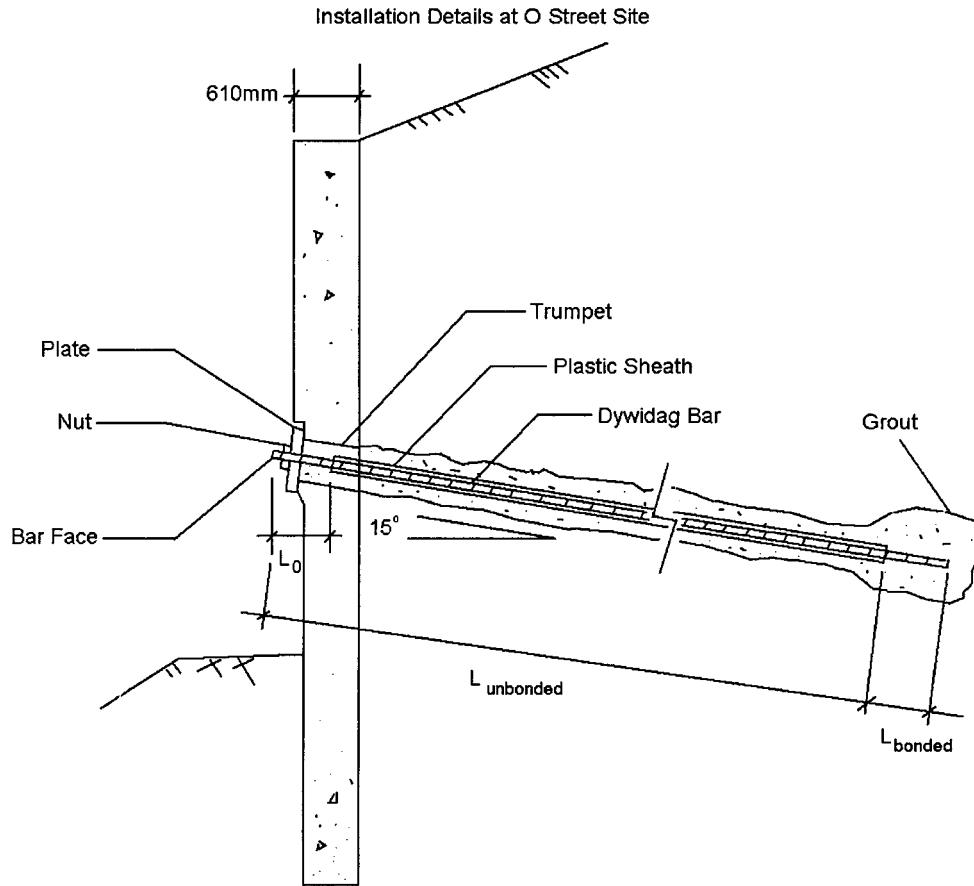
Schematic of bar element installed at O Street, Washington, D.C.
